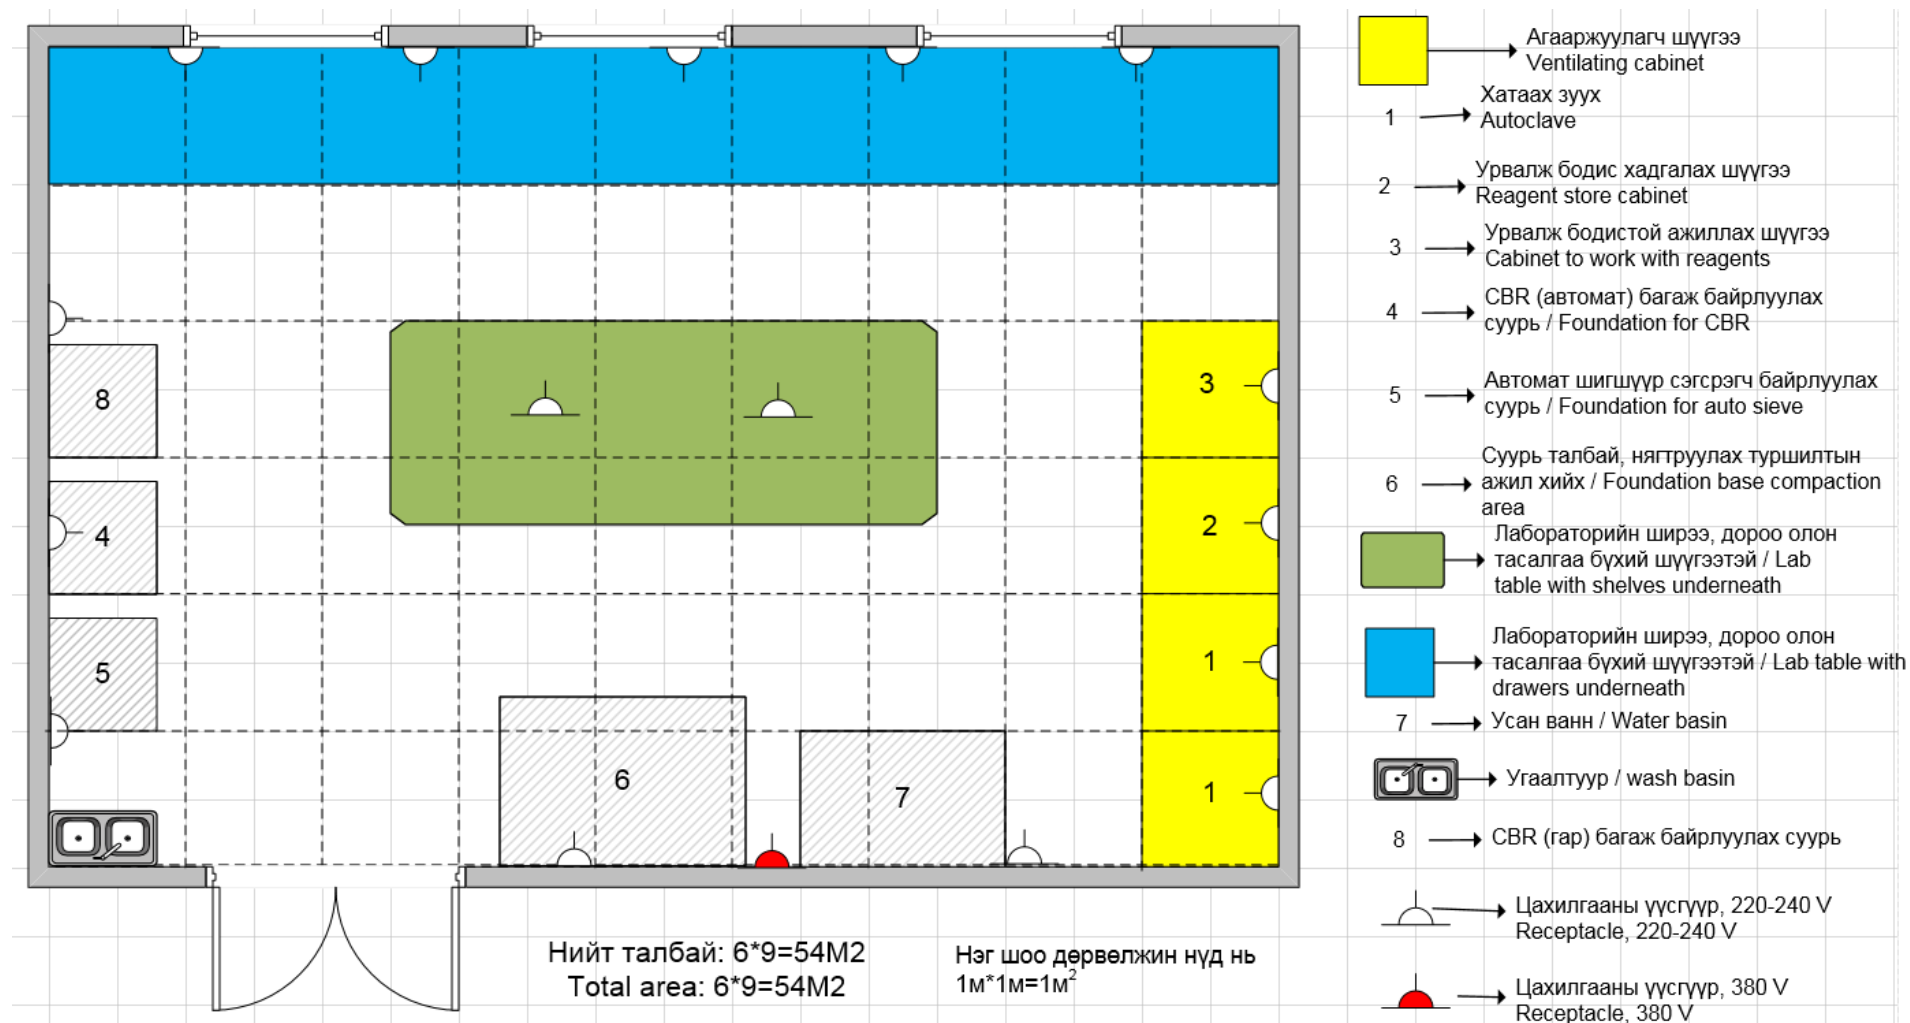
PRELIMINARY DETAIL OF ASPHALT CONCRETE TEST LABORATORY OF NEW BUILDING - AUTO MECHANIC (MECHANICAL AND BODY REPAIR) SHOP, 3d floor, Room 2 – Asphalt concrete test laboratory, 1 cell = 1m * 1m
